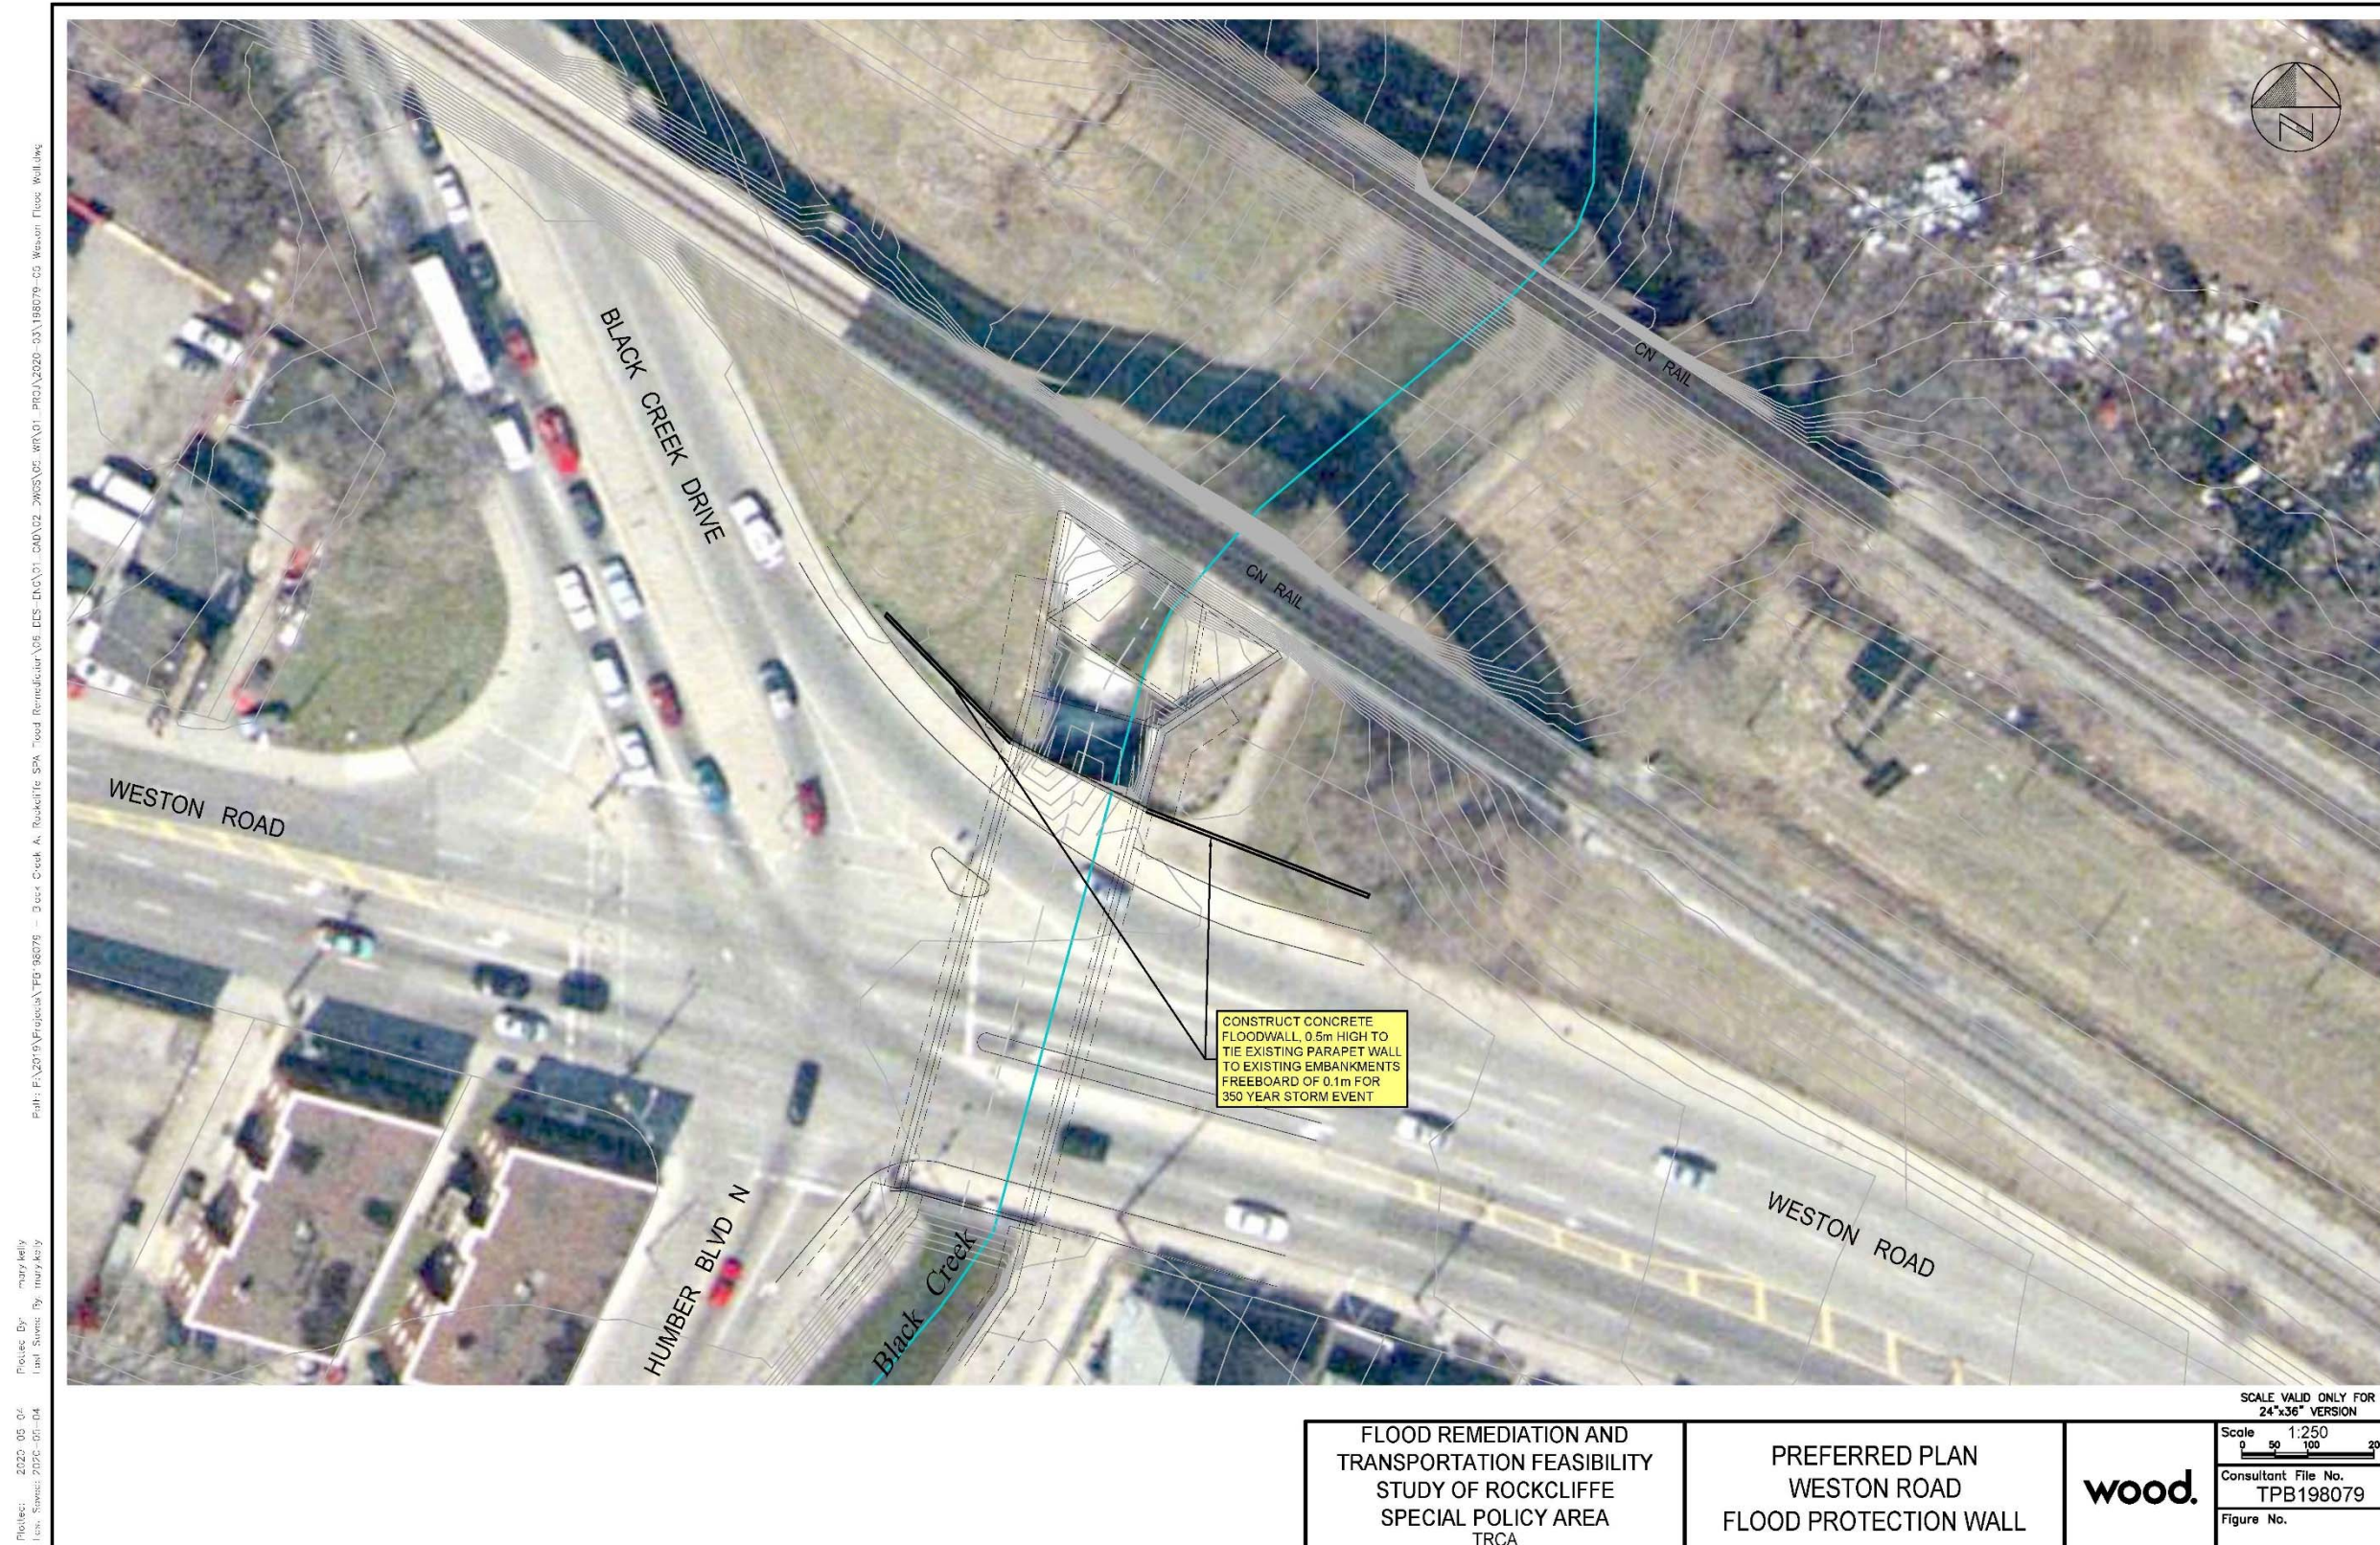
Preferred Alternatives - Weston Road Flood Protection Wall
